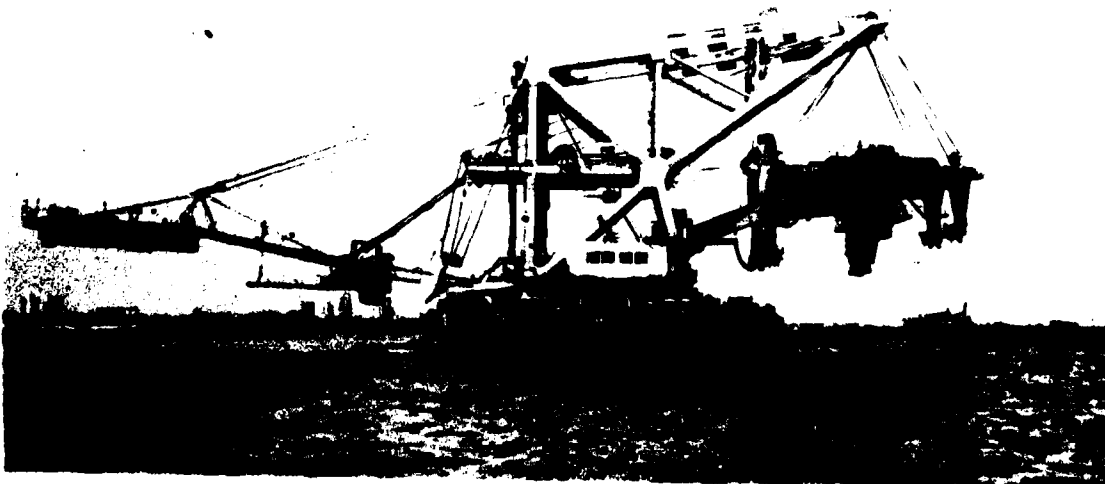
Reclaimer used at end of barge haul for unloading fill material to transfer to reclaimed land.
